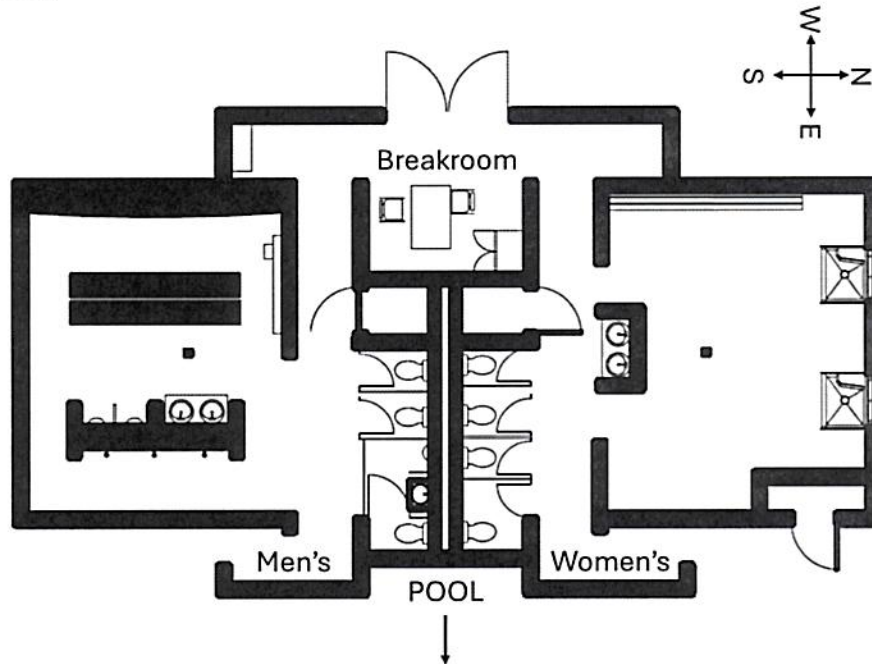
Heritage Pool Bathhouse Floorplan (Tab Z-21)
